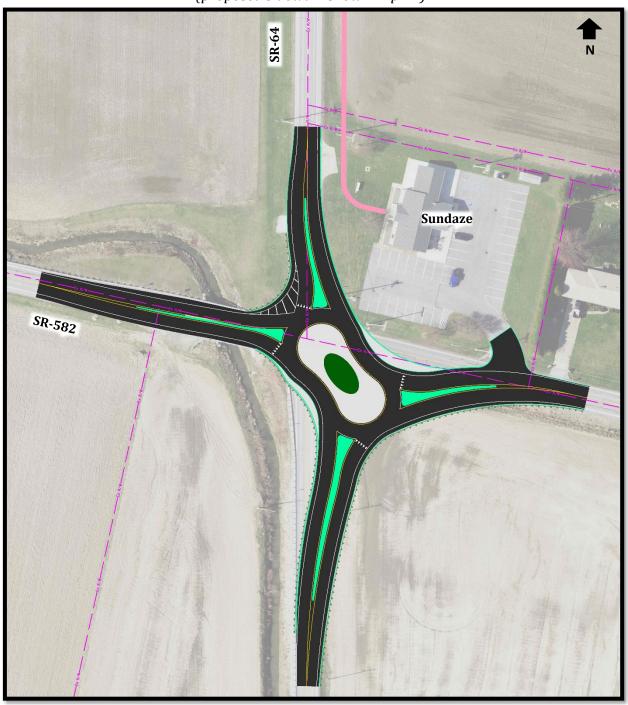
Proposed Conceptual Planning-Level Peanut Roundabout Installation (proposed sidewalk shown in pink)
